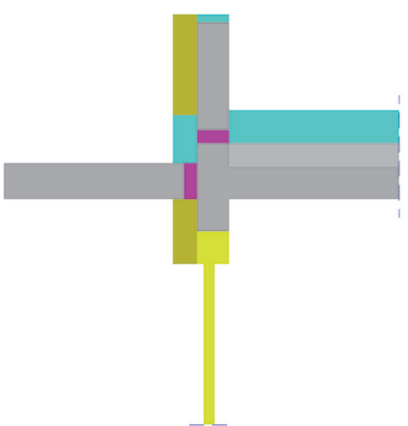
Detail 5c, thermal bridge break TB1 and TB2
